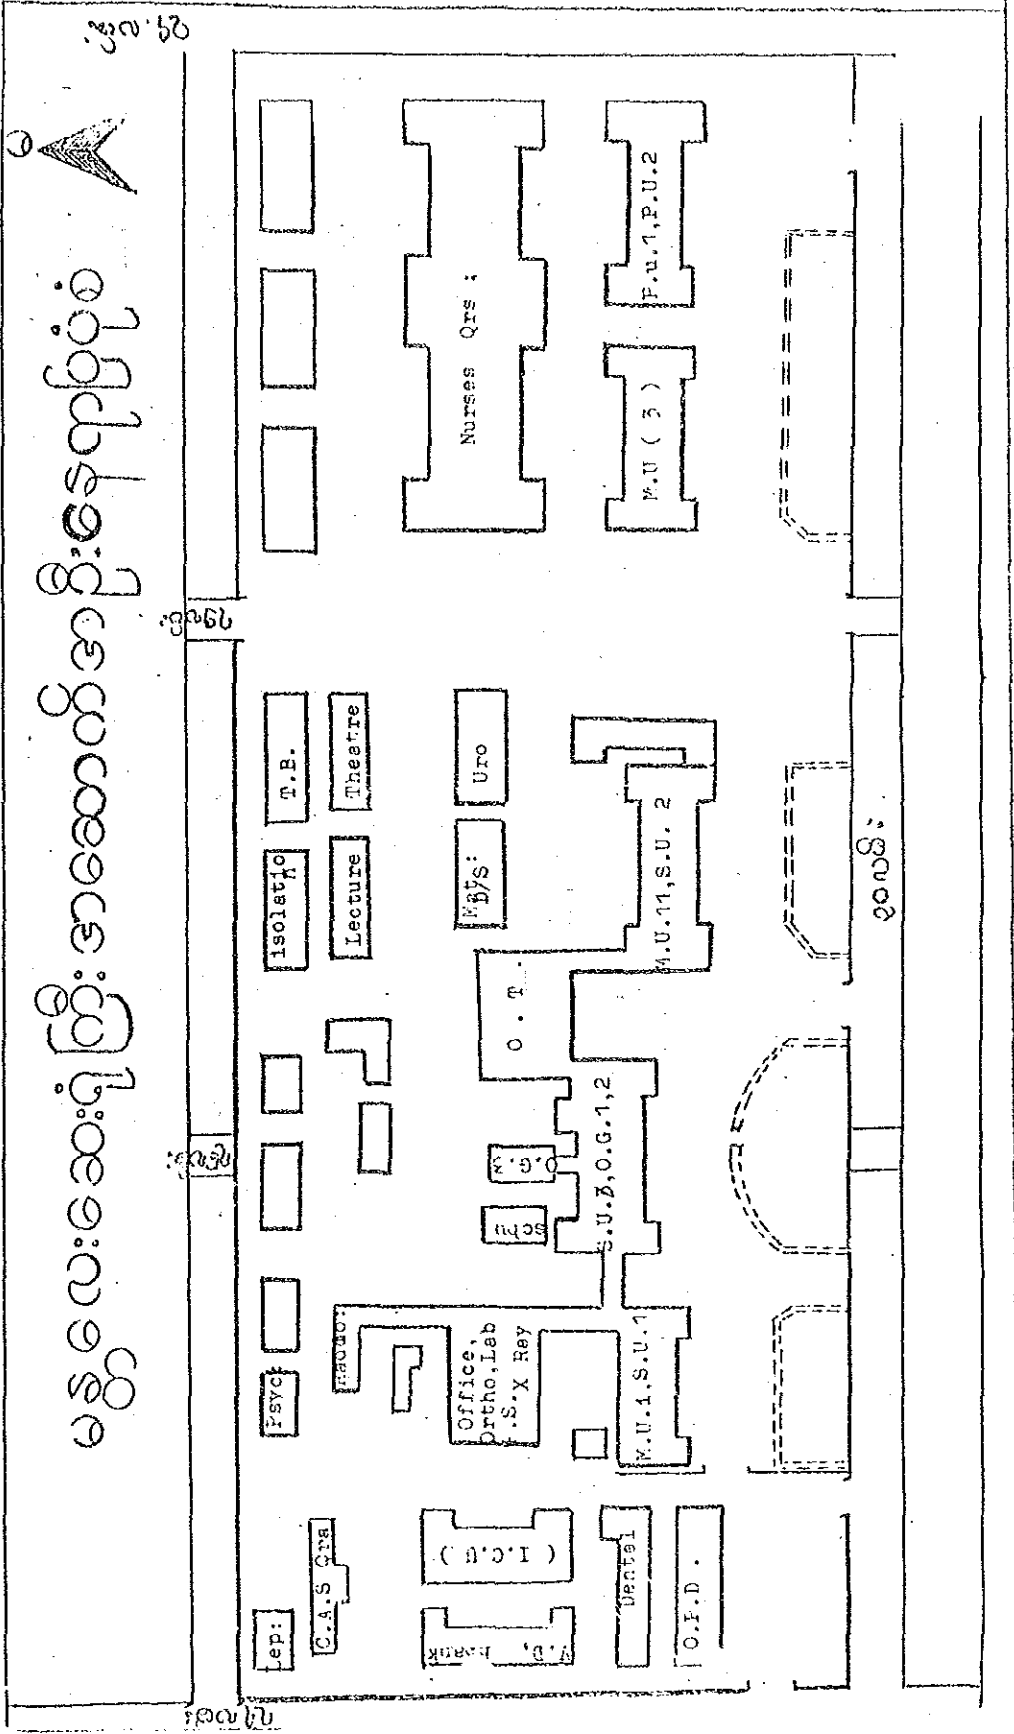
THE EXISTING BUILDINGS OF SITE
